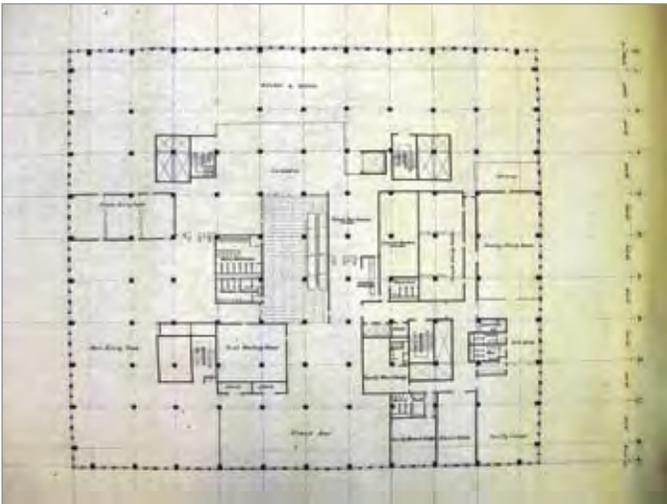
PLAN SKETCH, SECTION A-A, MARCH 1963. | CONCORDIA ARCHIVES.
